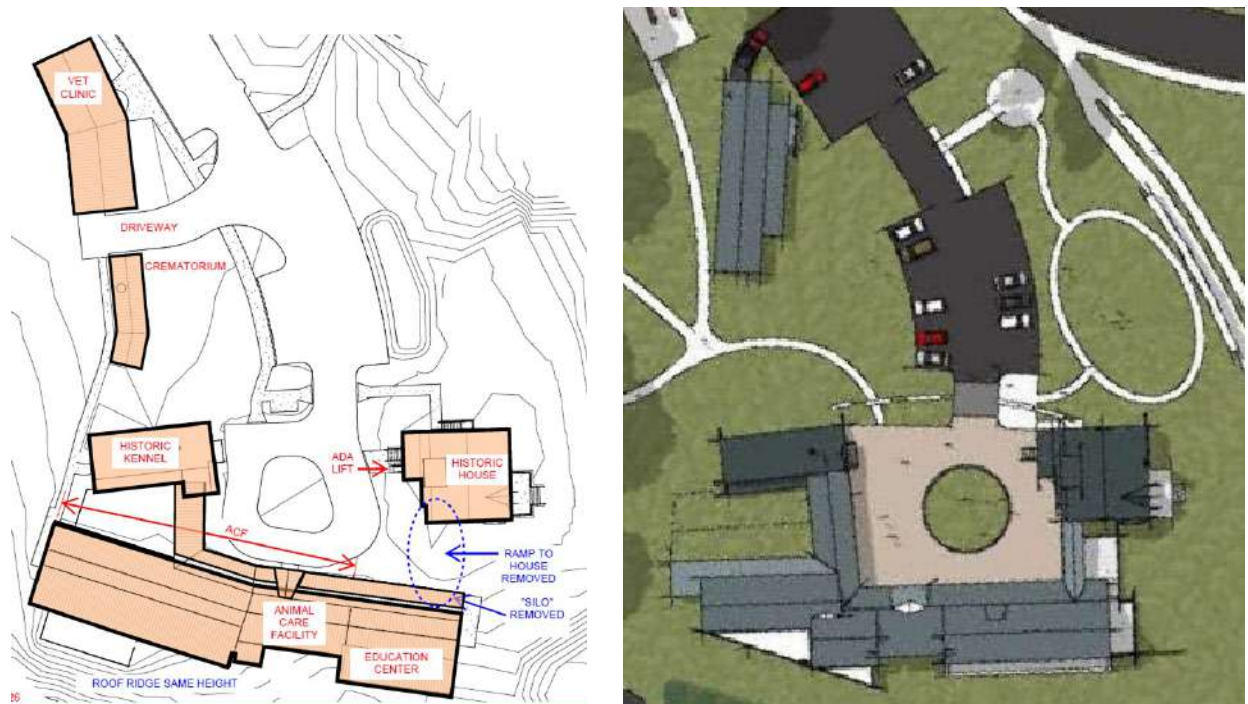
Current proposed building layout (left) and 2019 preliminary consultation layout (right).
